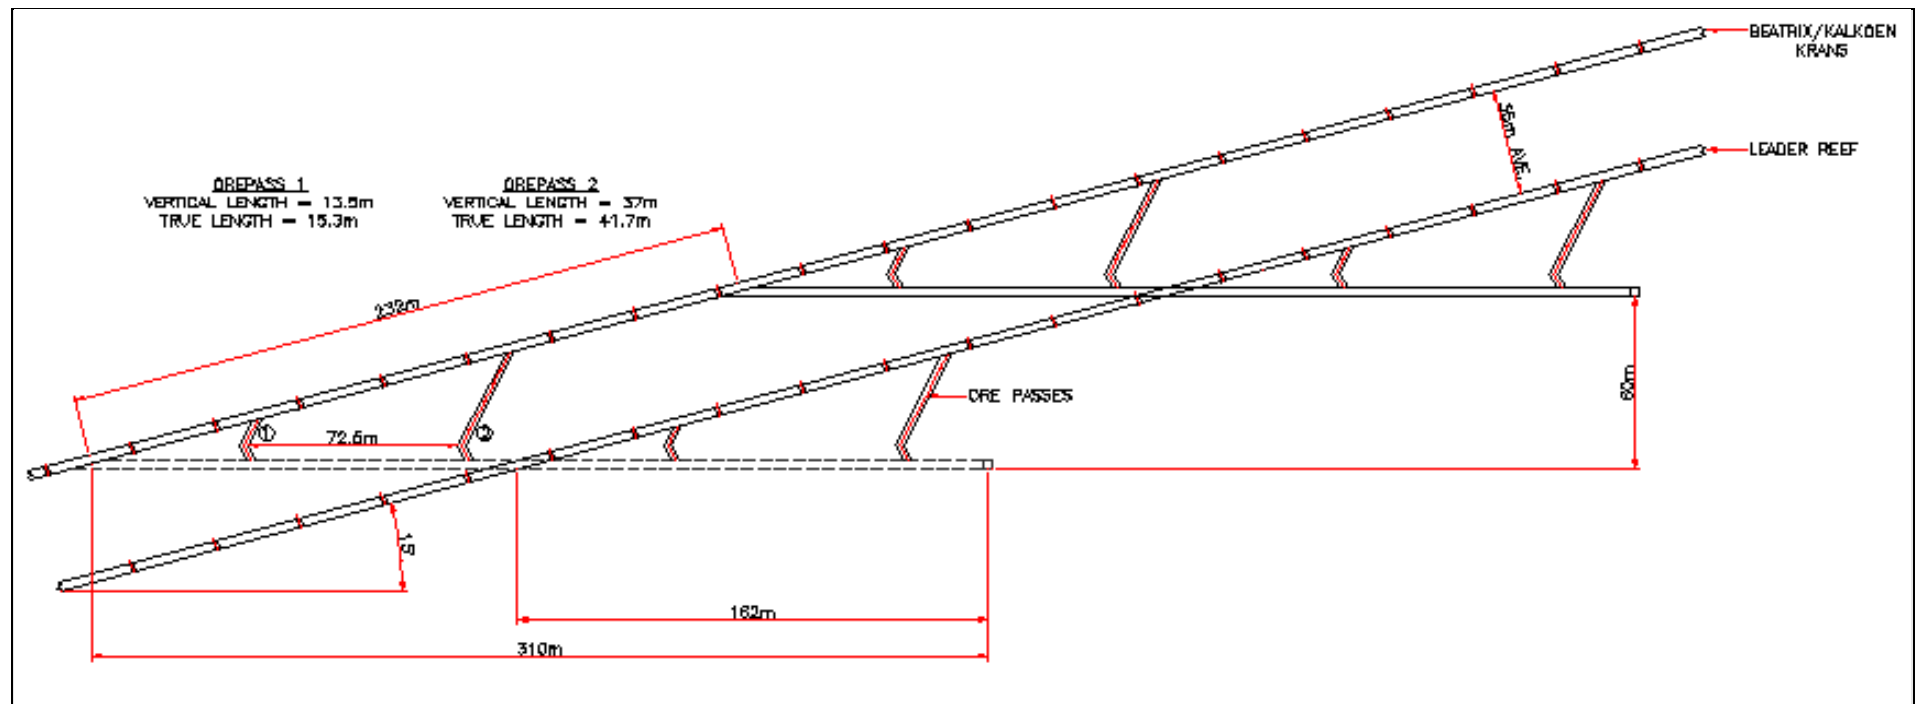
Section through stope showing stope ore passes connecting to crosscut development
